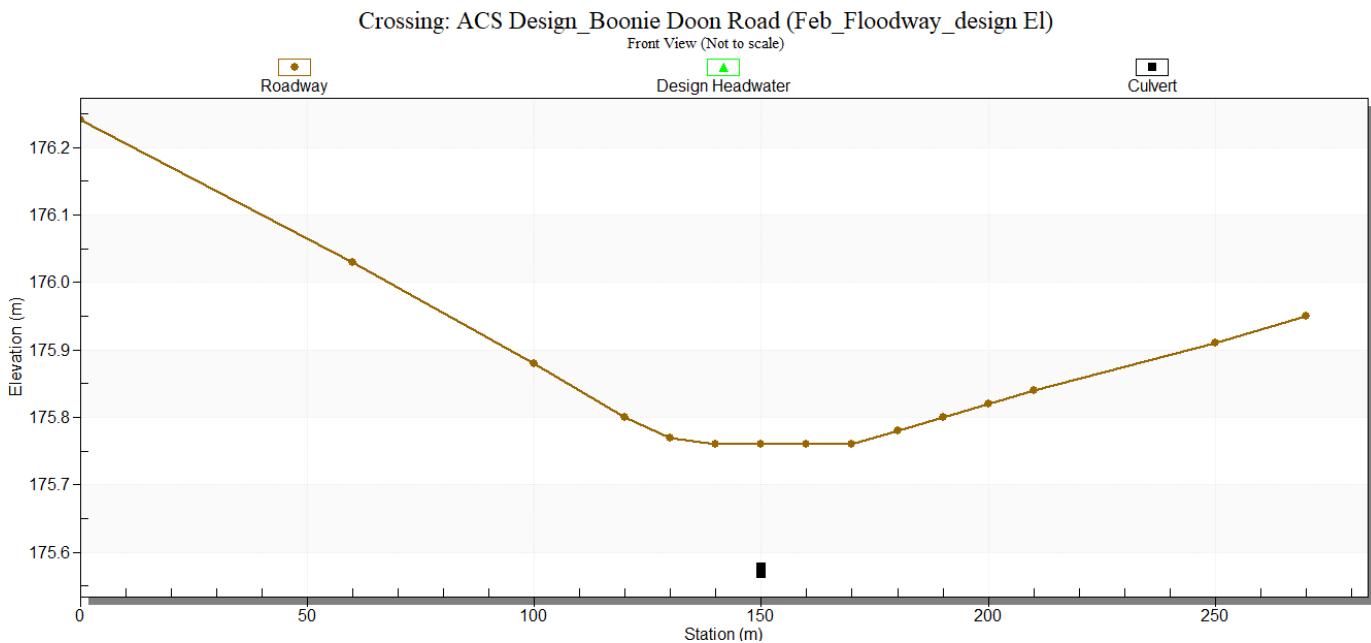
Proposed road elevation (Station 0 = Ch 1+200; Station 150 = Ch 1+050)
